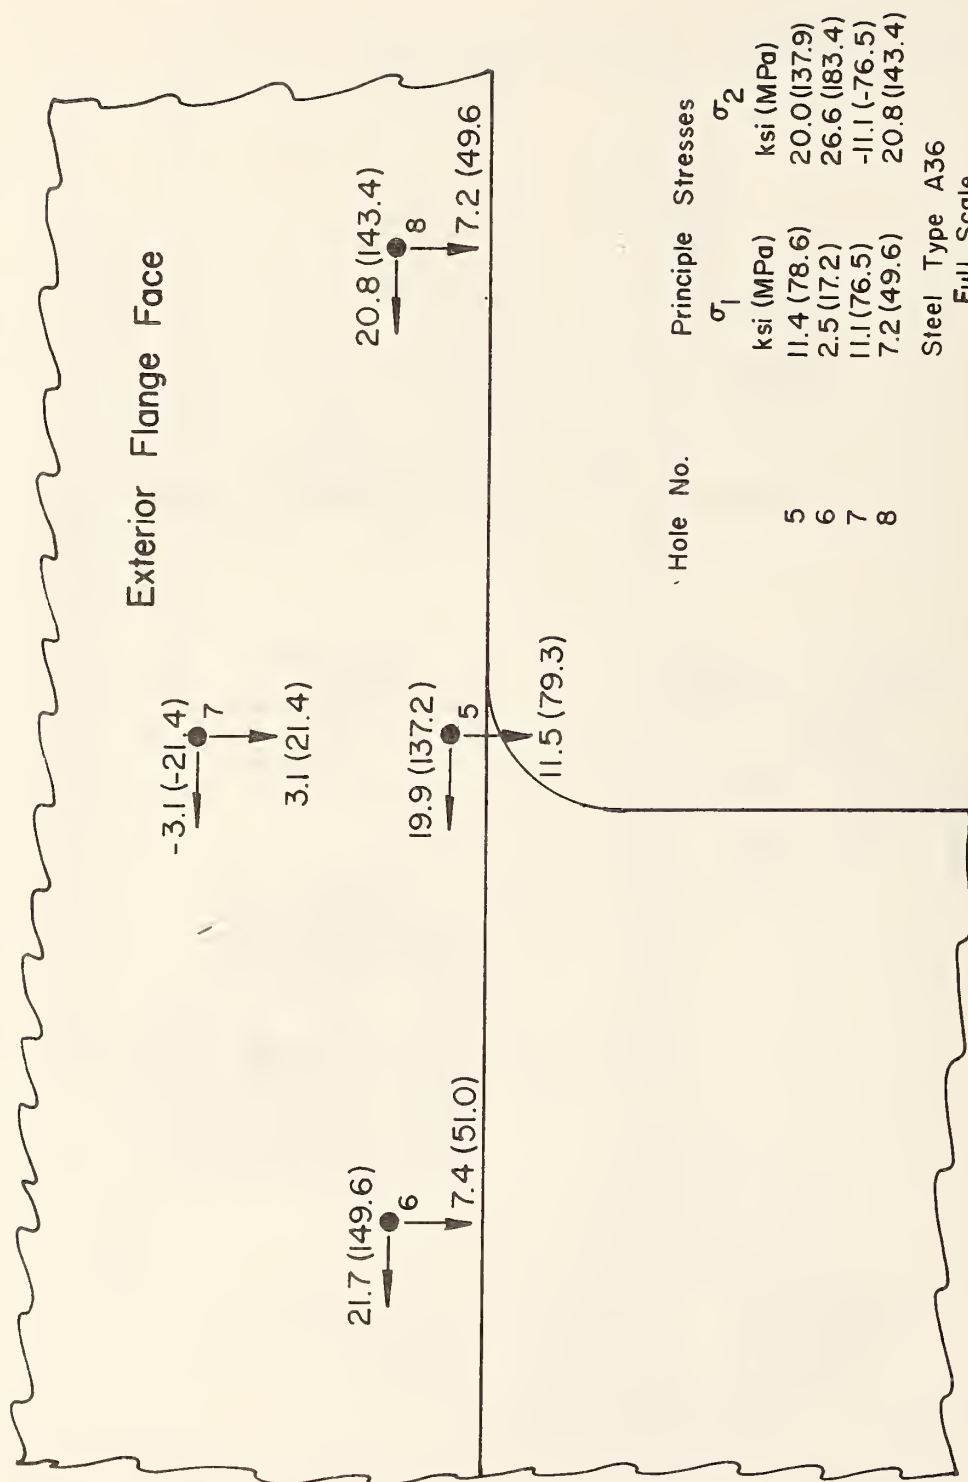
Groove Weld Lateral Attachment Surface Residual Stresses
